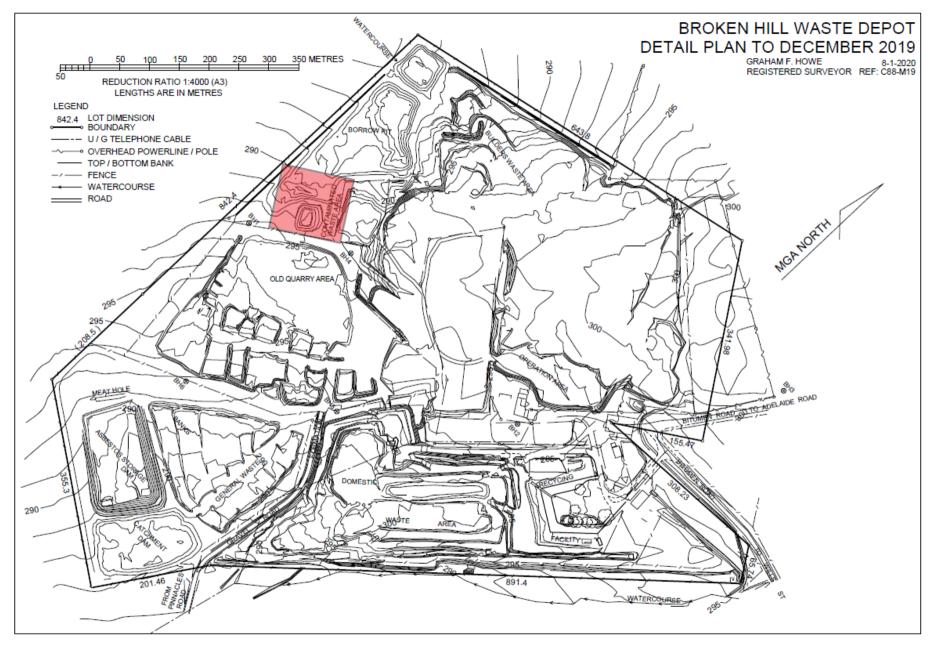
Broken Hill Waste Management Facility 2019 Survey Plan
